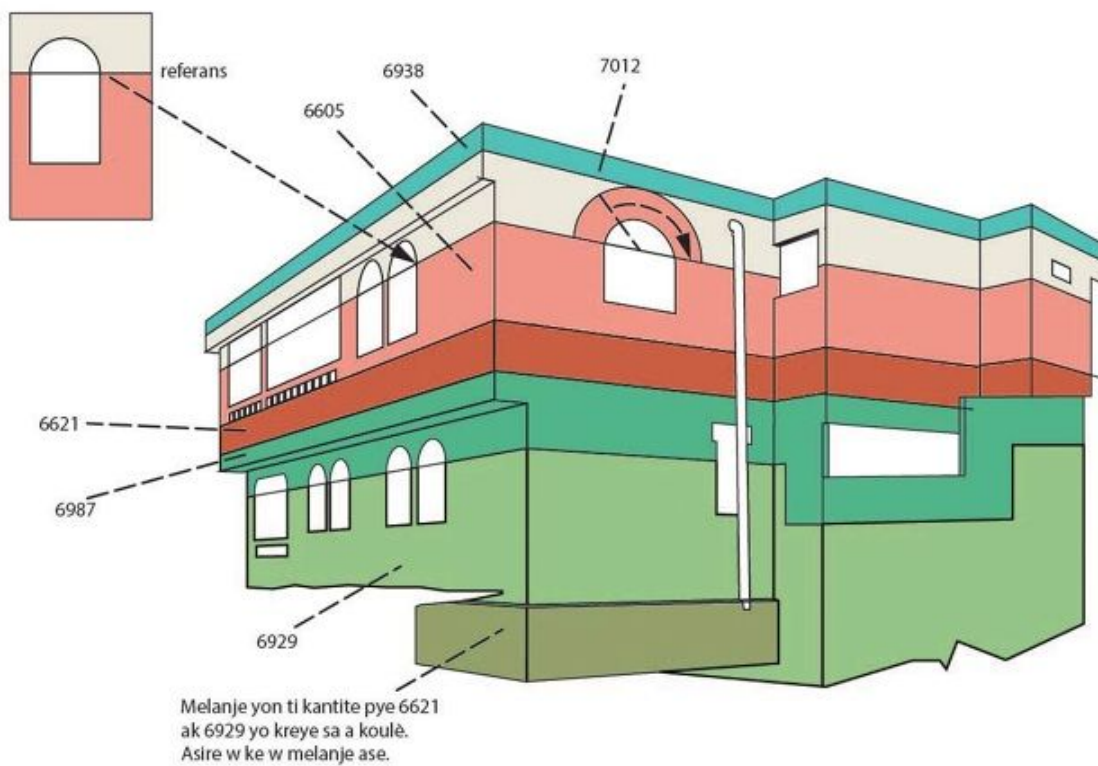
example of a proposed paint plan (Favelapainting, 2016).
